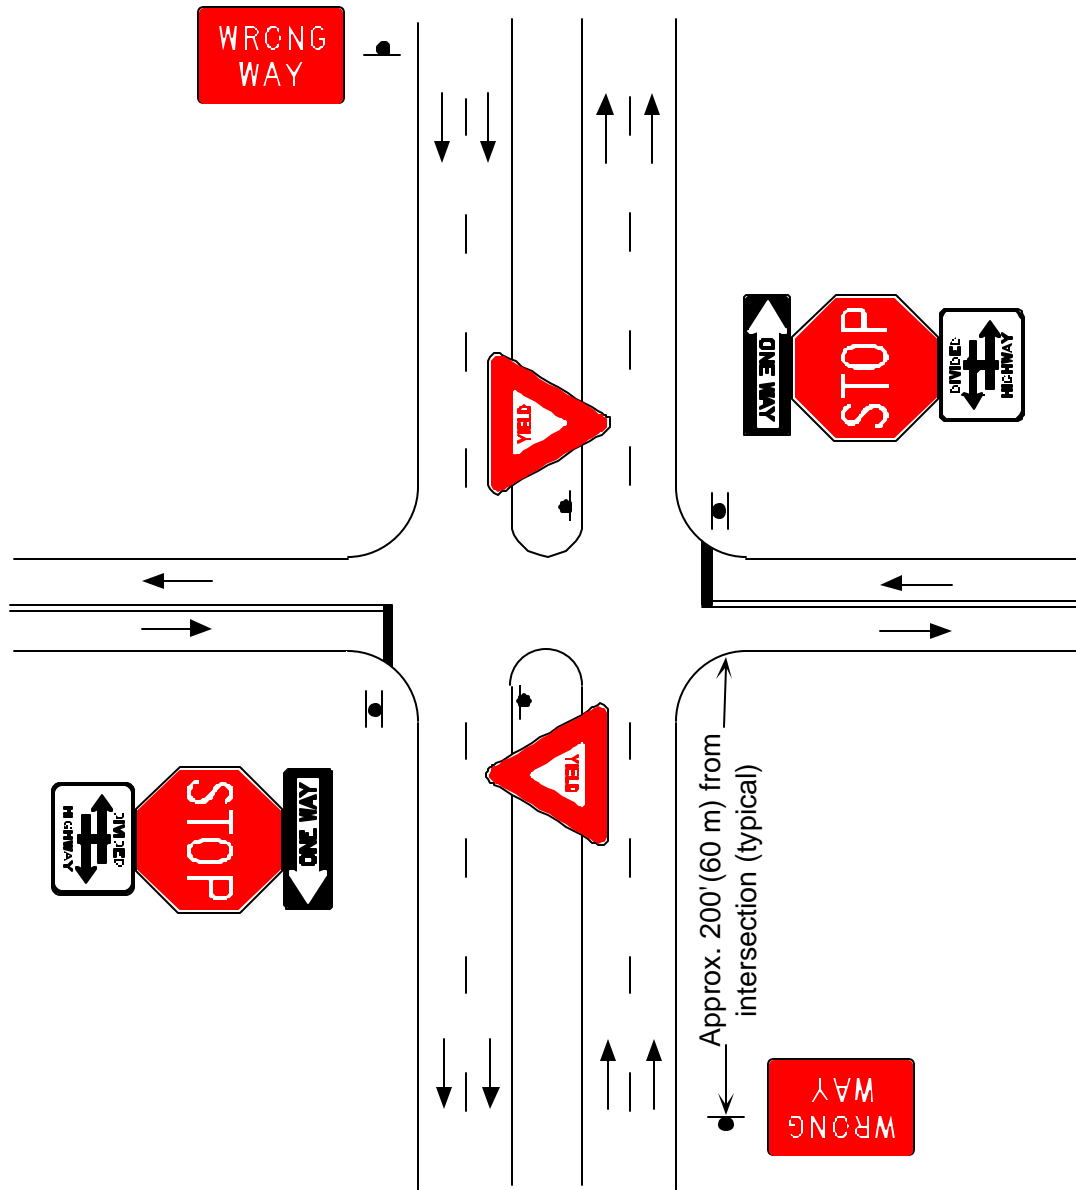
Typical Signing At Divided Highway Intersections With Median Width Of Less Than 30' (9.1 M)
